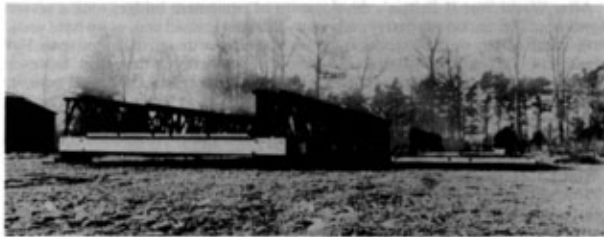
A 7.5m wide Mabey Universal Bridge compared with a 3.28m wide Bailey Bridge. *Mabey Group
